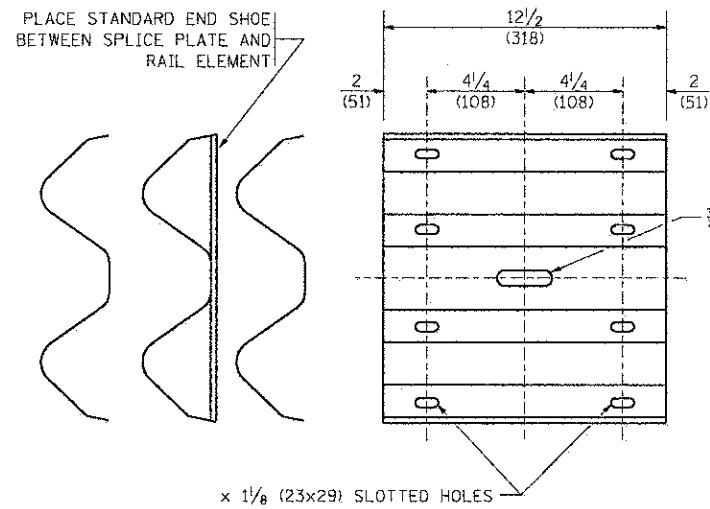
PLATE A SHALL BE PLACED BETWEEN RAIL ELEMENT AND BLOCK-OUT AT NON-SPLICE MOUNTING POINTS ONLY WHEN STEEL BLOCK-OUTS ARE USED.
